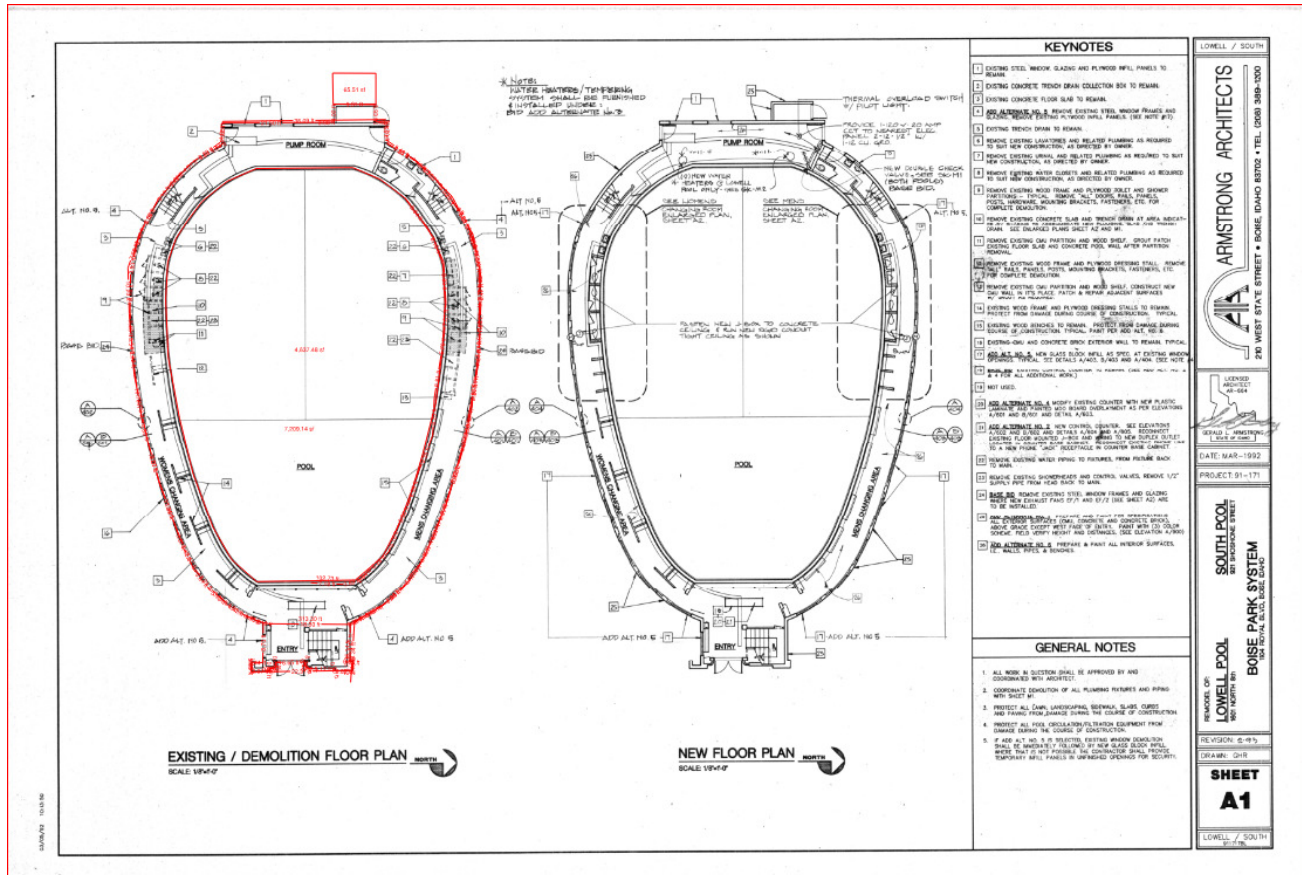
Existing Drawing Showing Plan of Lowell Pool
